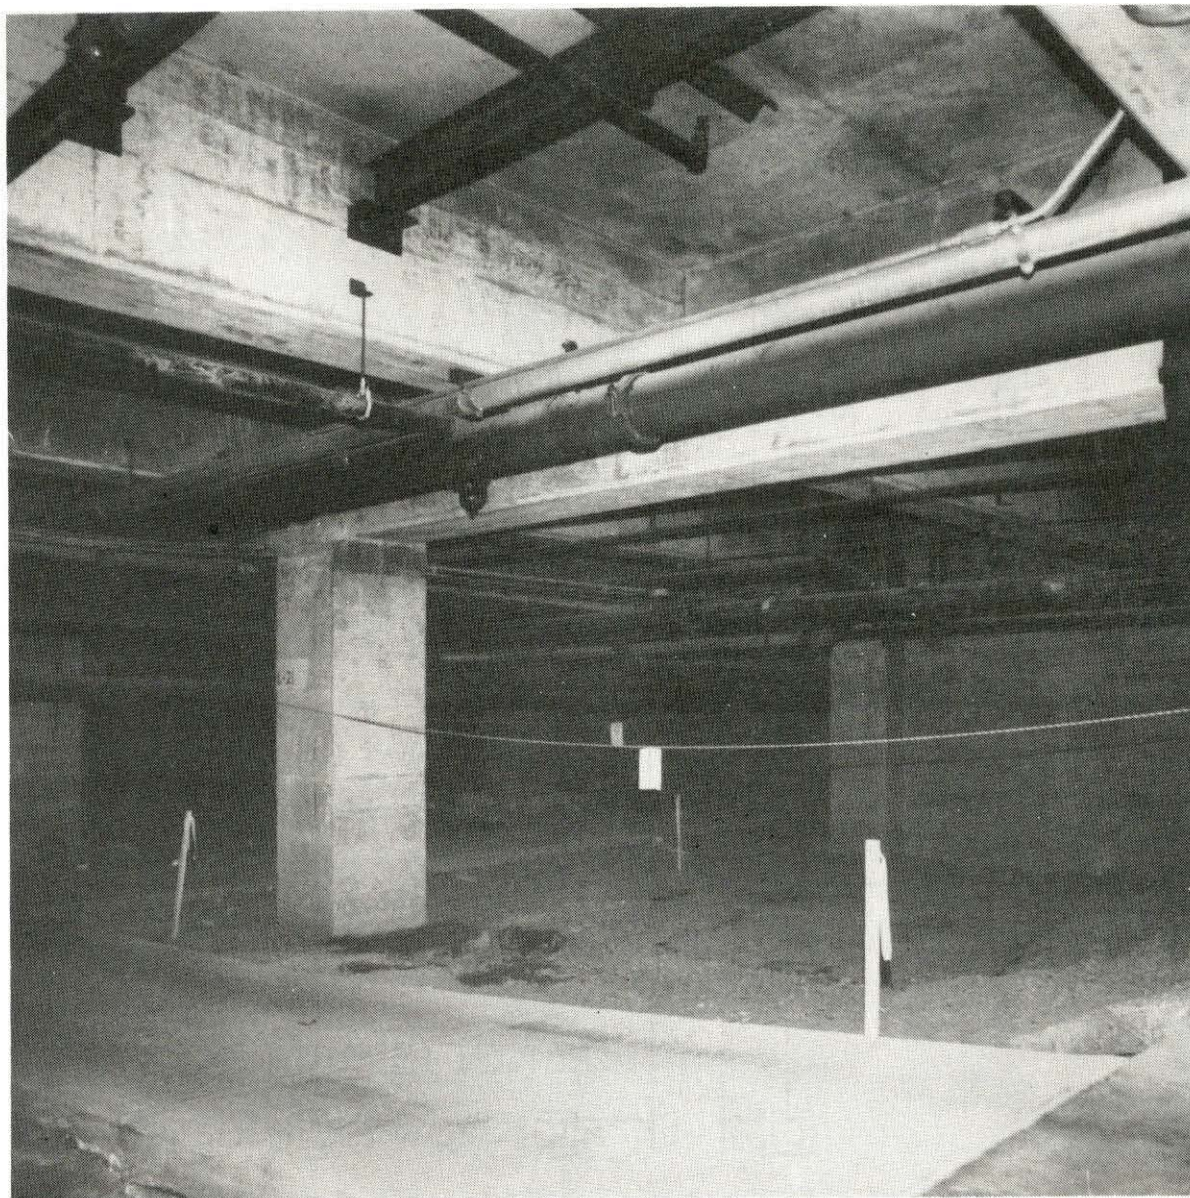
East end basement of Building 9204-1, looking southeast at radiation zone, Section IV.
